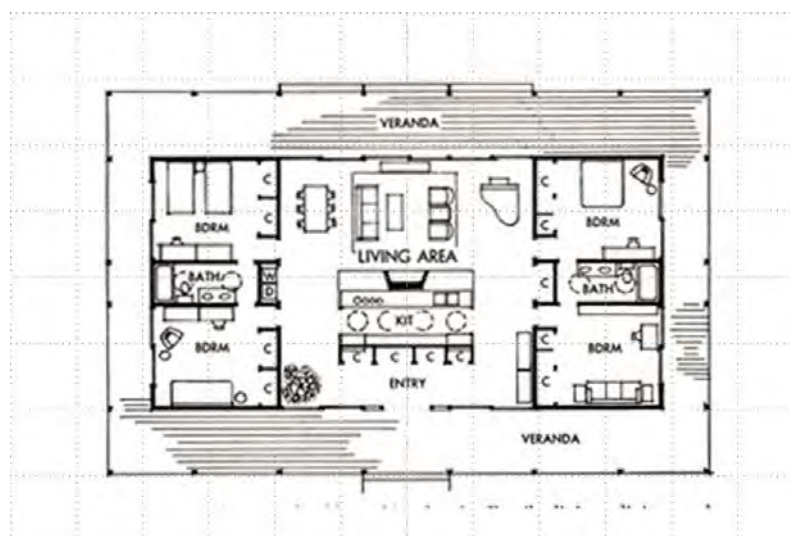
John Black Lee House II Plan (Kuehnl, 1958)
